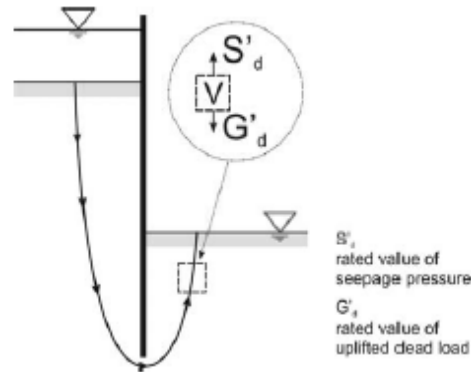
Schematic illustration of hydraulic heave on a building pit wall (Wudtke 2008)
